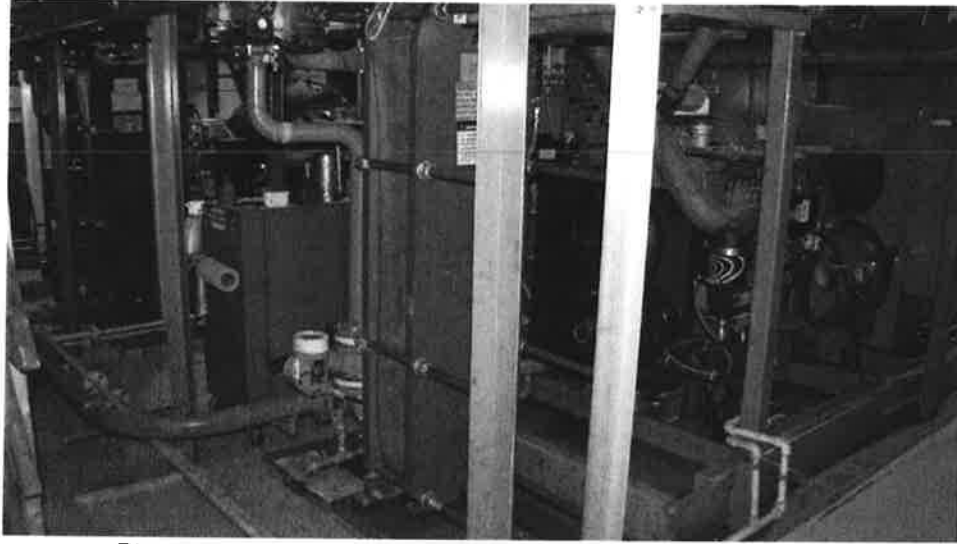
Jacket Coolant Heat exchangers (installed in 2008)
